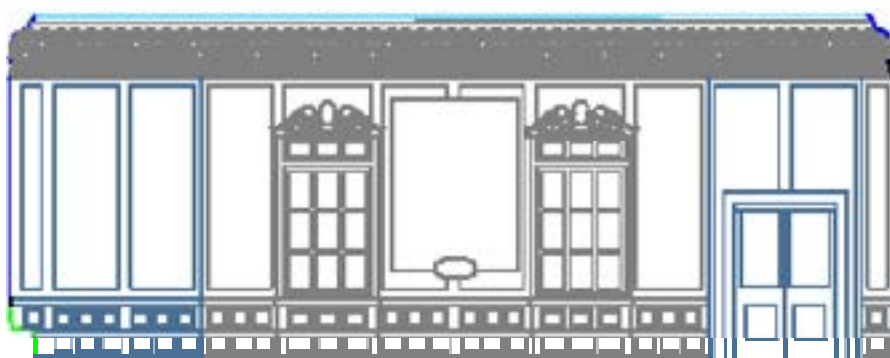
Proposed location of doors to New Foyer. Existing Doors to be reused.
